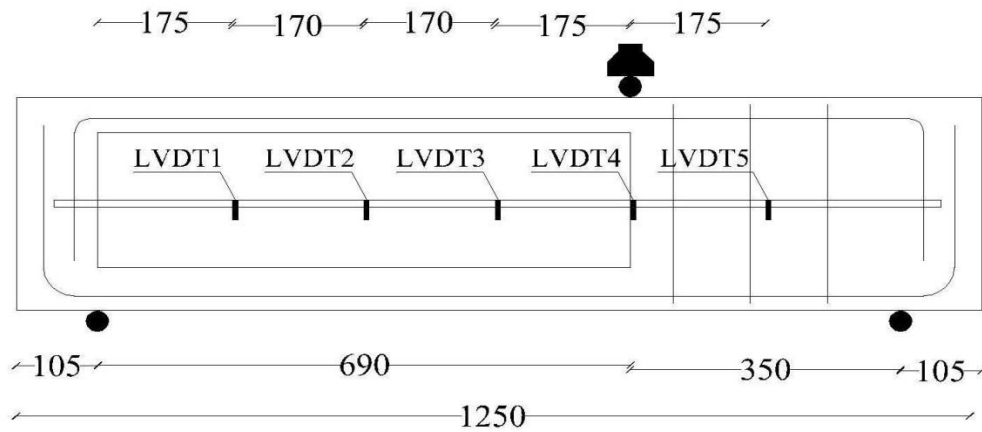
Beam's configuration, test setup and position of the LVDTs (dimensions in mm)
